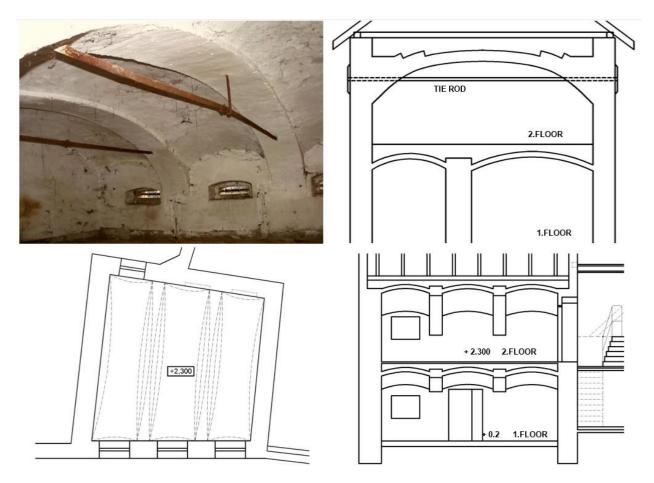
Baroque vaulted granary; the ceiling structure is formed by an arch with a tie rod; above - situation of arches and tie rods before modification and longitudinal section through the arch bottom - plan of the granary and cross-section of the arches andinfill vaults
